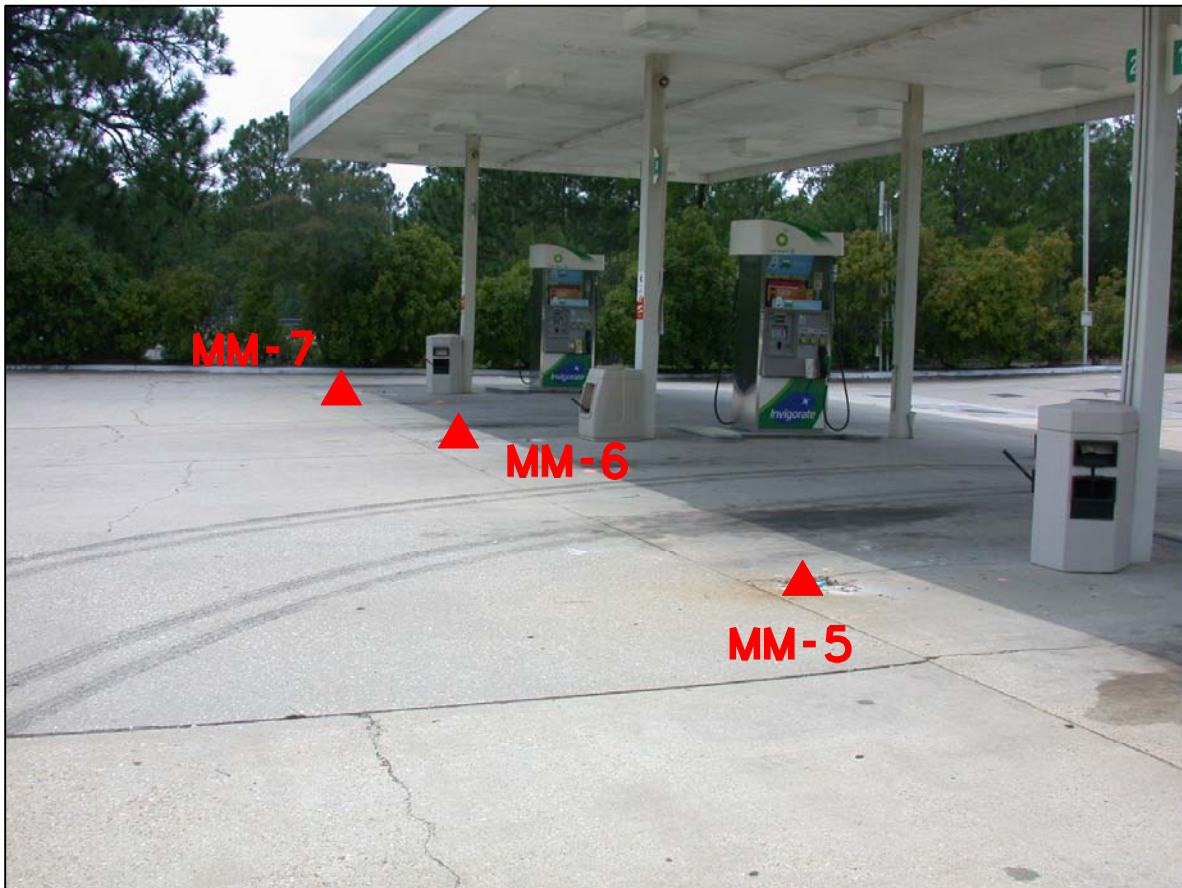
BORINGS WITHIN PROPOSED R/W LOOKING SOUTHWEST
